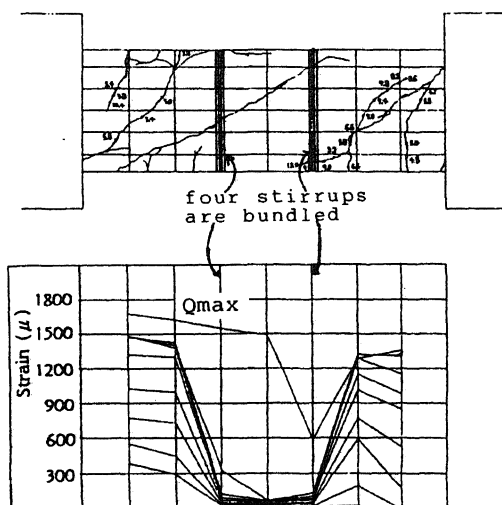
Crack pattern and strain of shear reinforcement of specimen No.3
